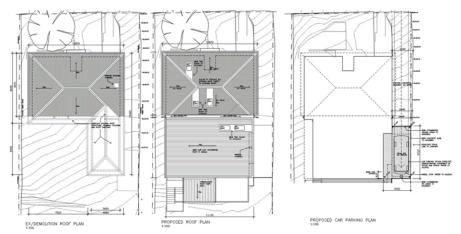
Demolition, Roof and Parking plans (Steven Spizick Architect, 2021)
